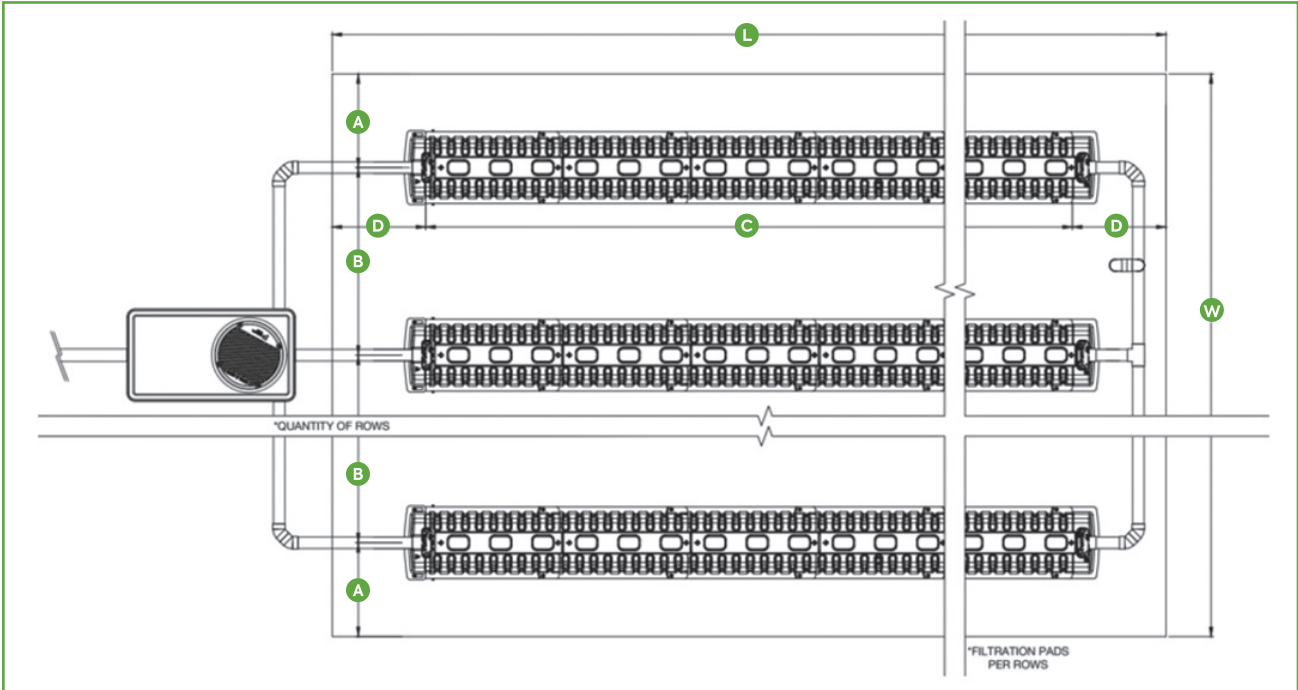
| Typical bed layout — Slope between 0 to 4%
